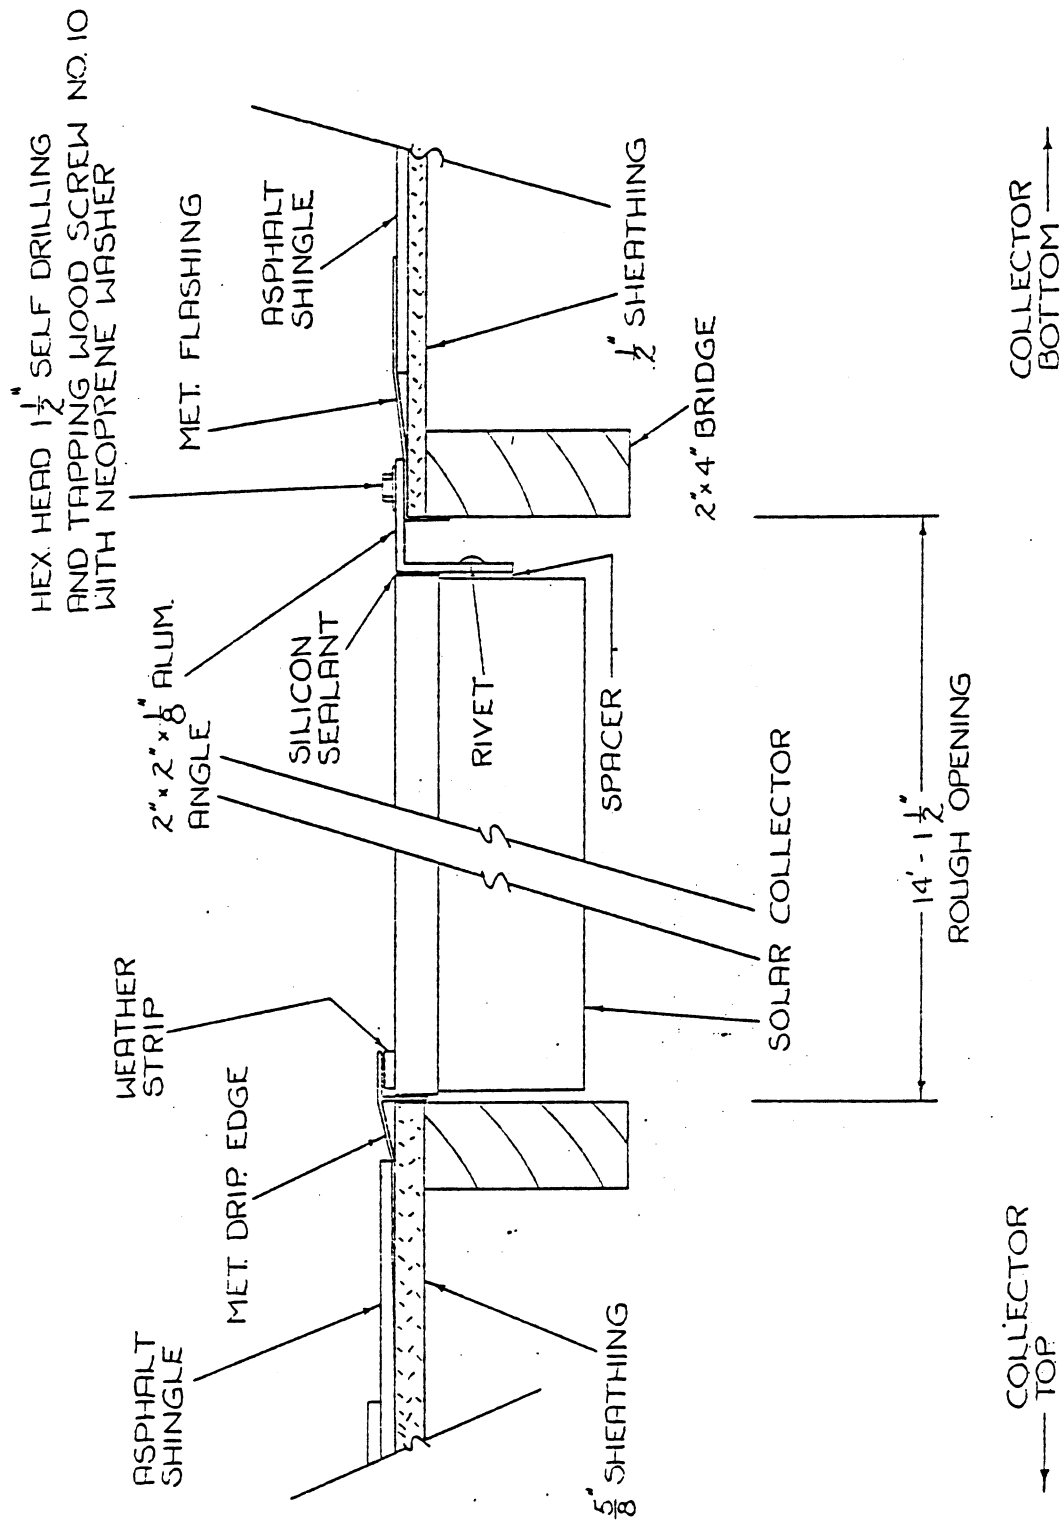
Section AA from Figure A-2 showing additional details for mounting solar collectors to roof of building.
